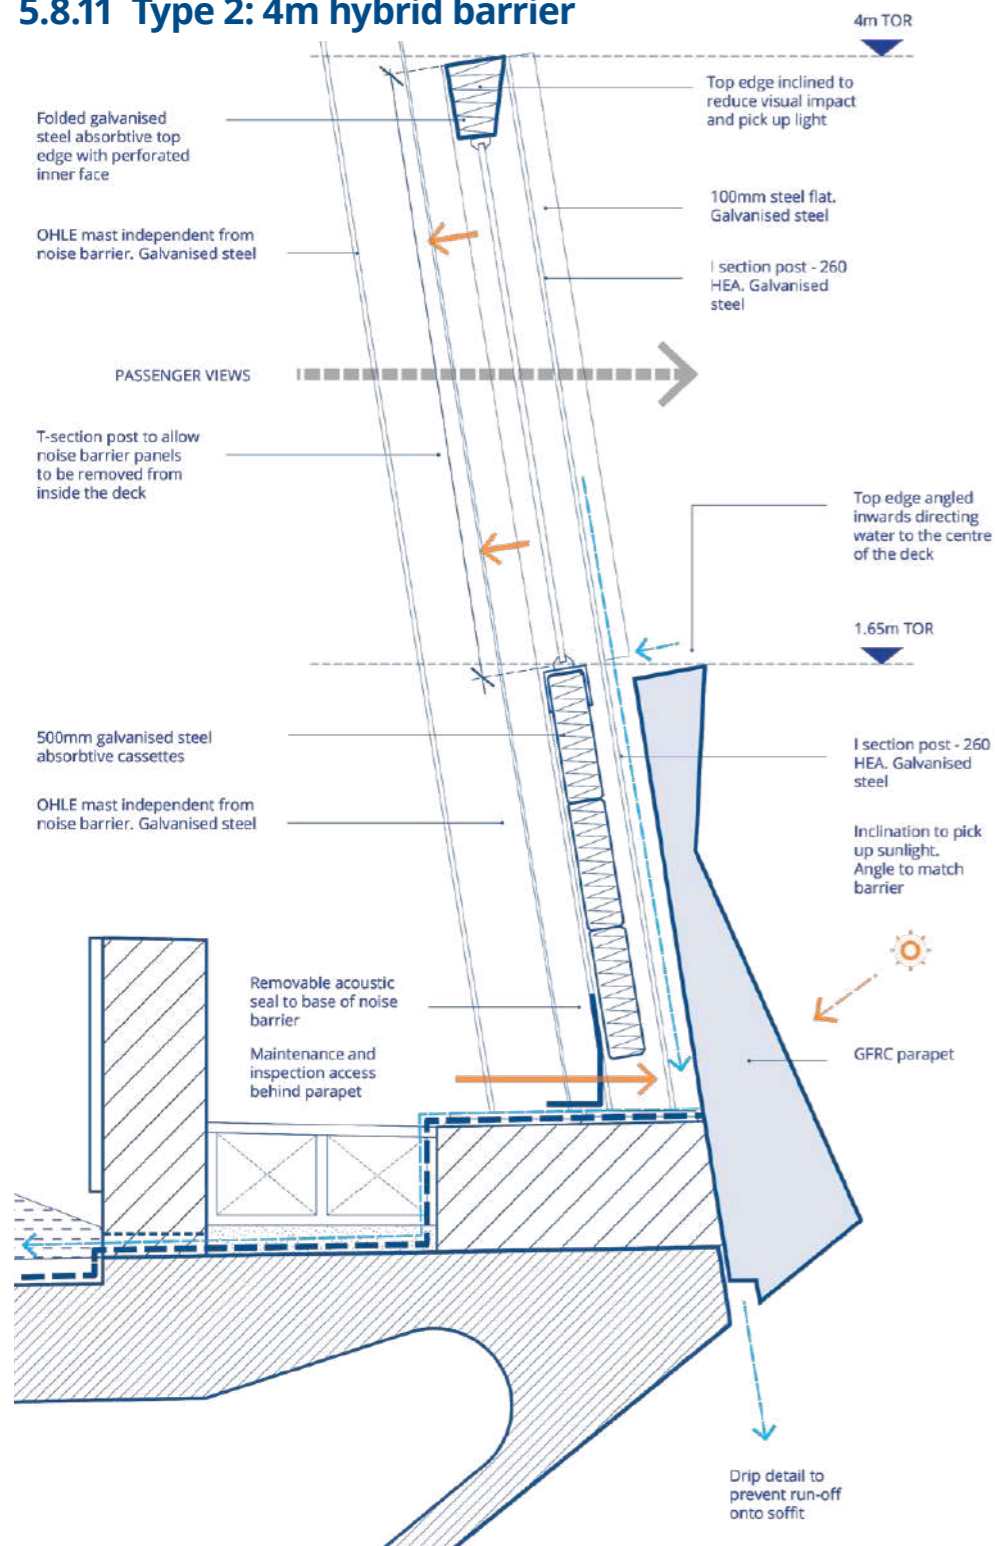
\_ Detail section - 4m hybrid noise barrier
